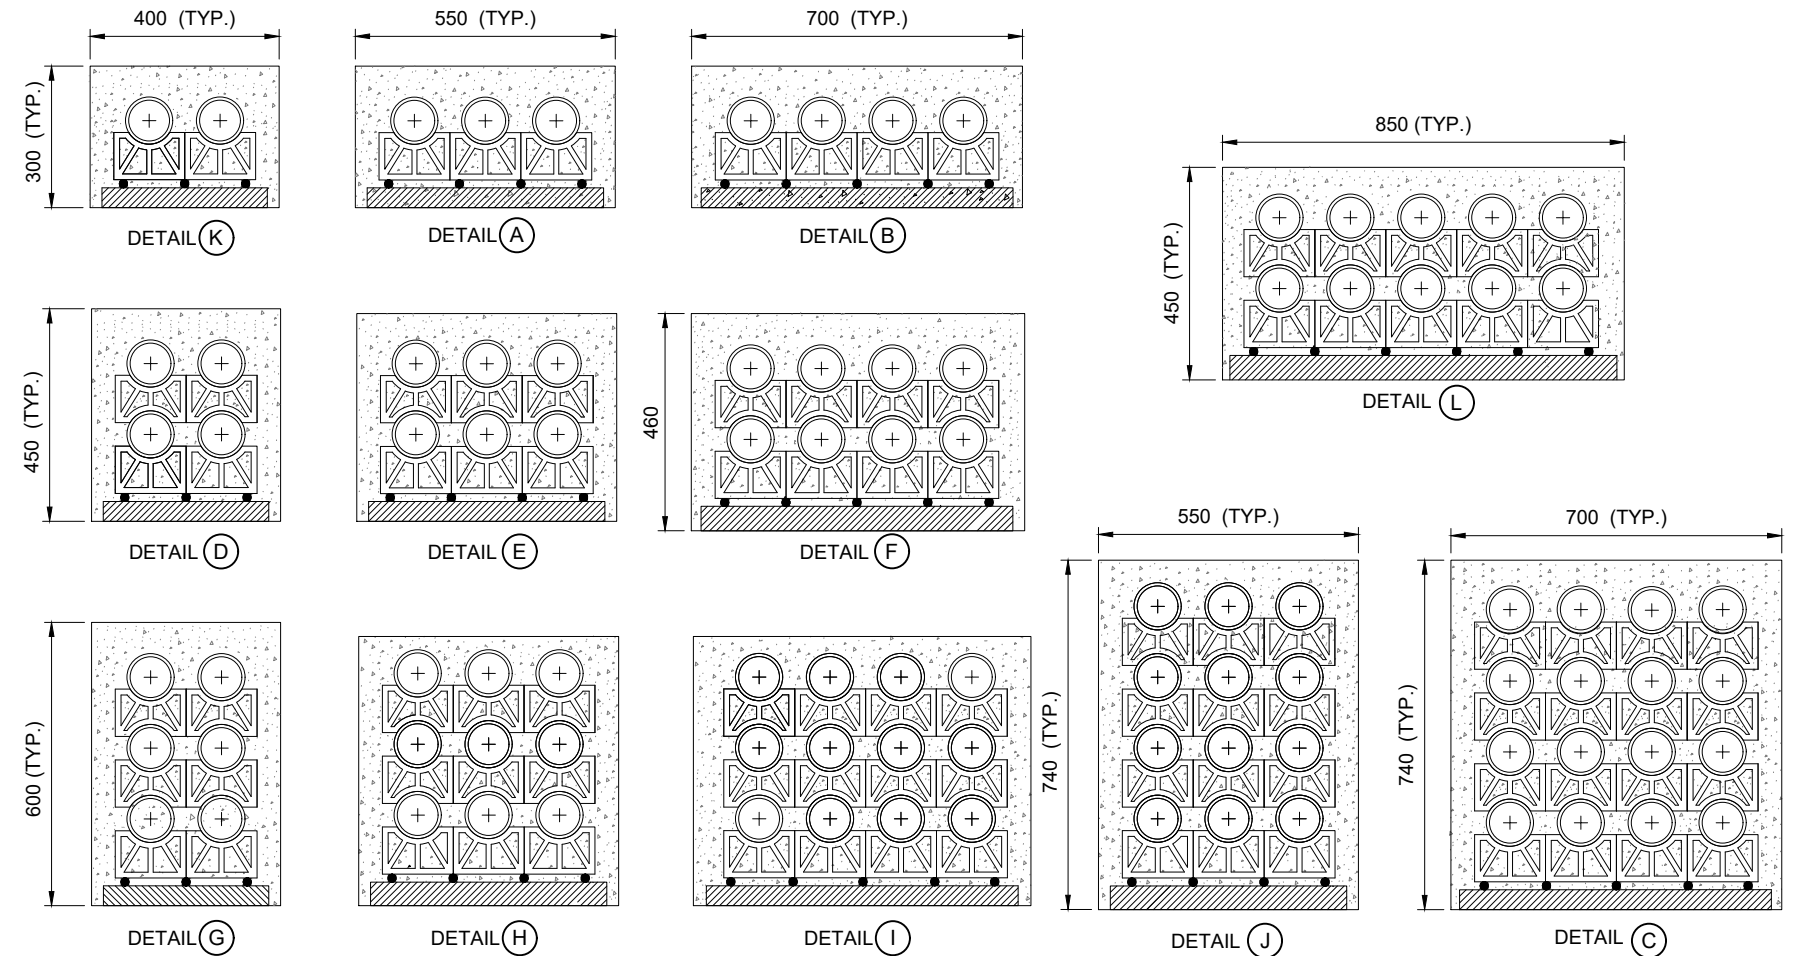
TYPICAL CONCRETE DUCT BANK SECTION VIEW
